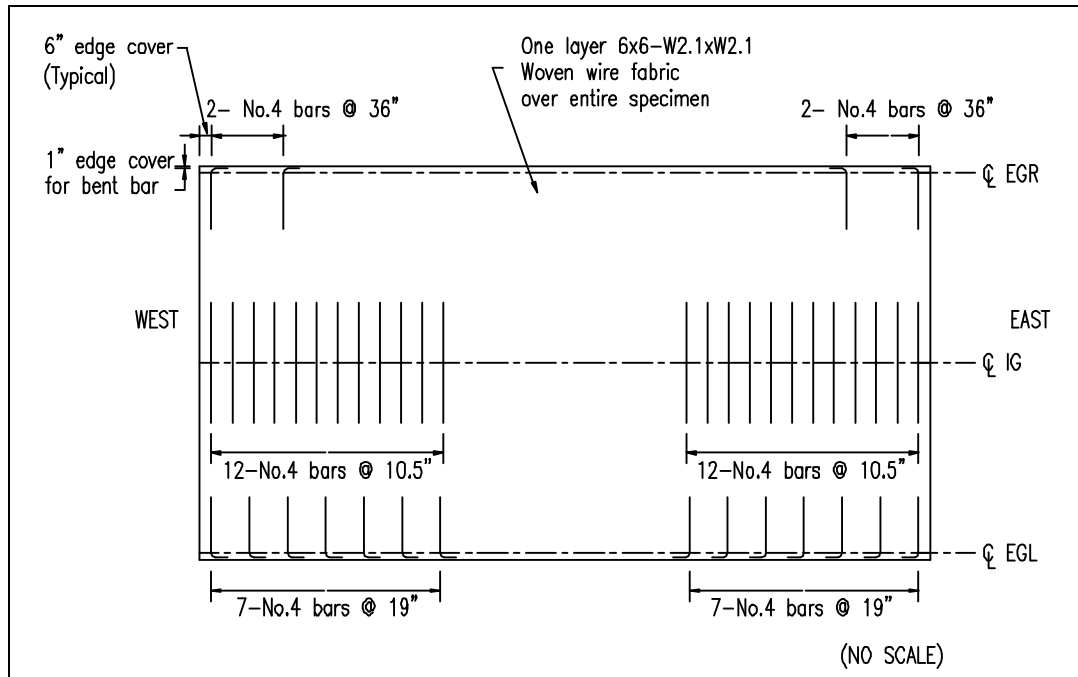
Stub-Girder Slab Reinforcement Layout
